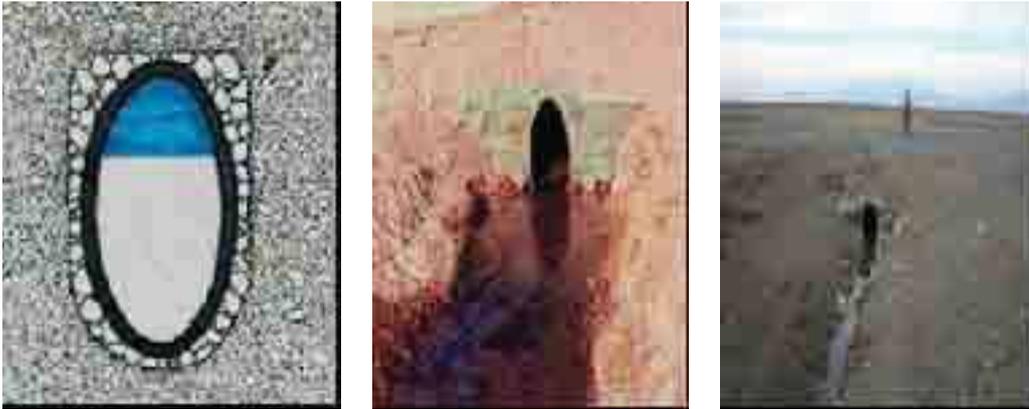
Kouhpayeh tunnel walls have been strengthened with tile hoops in downhill end.
